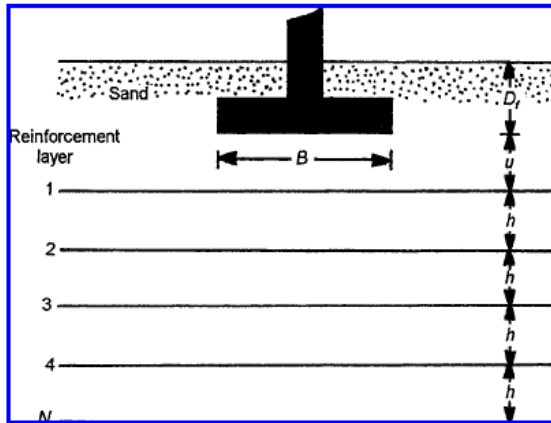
Foundation on metallic strip reinforced granular soil
